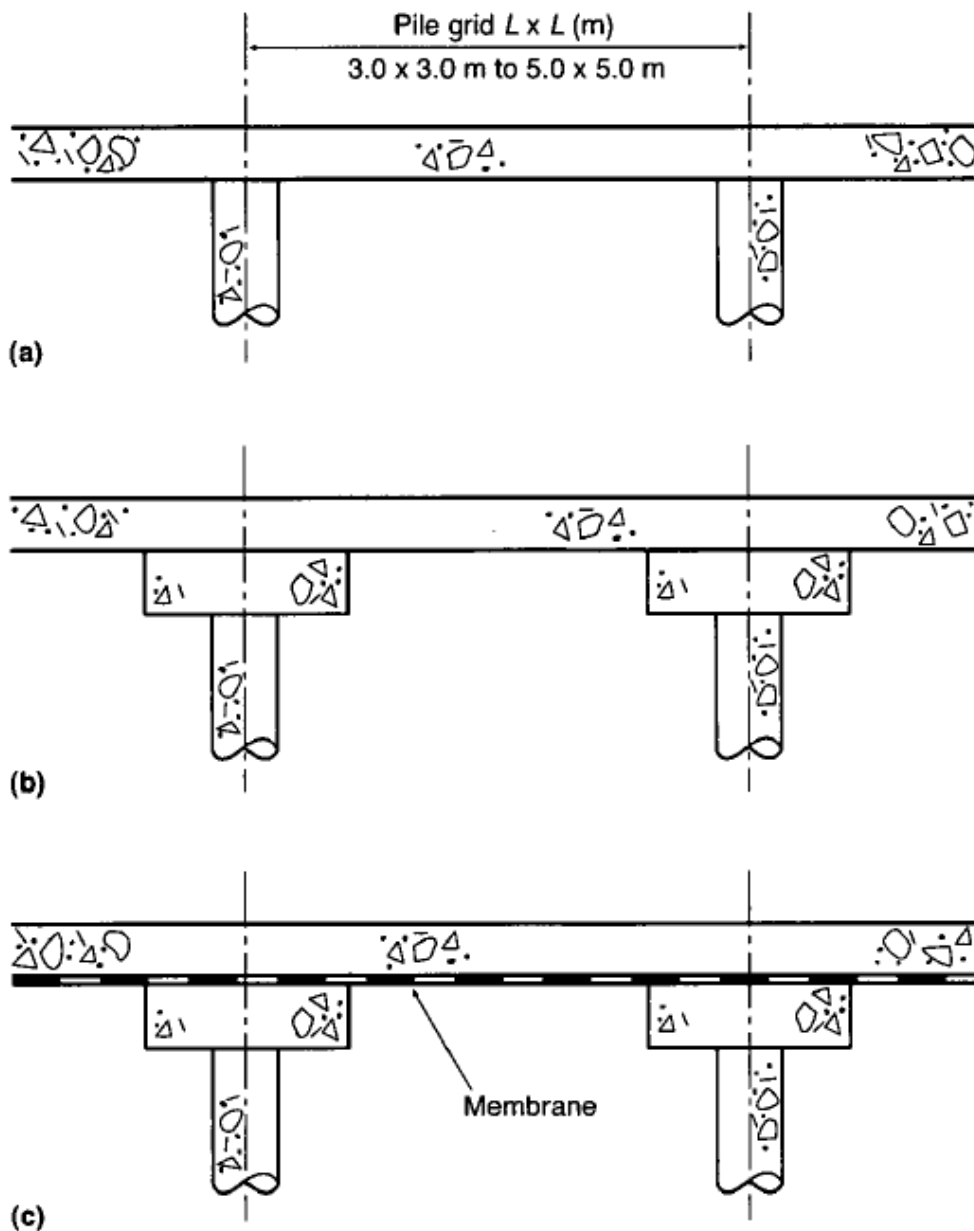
Cross-section of typical pile-supported slabs, as adopted from (The Concrete Society, 2003)
